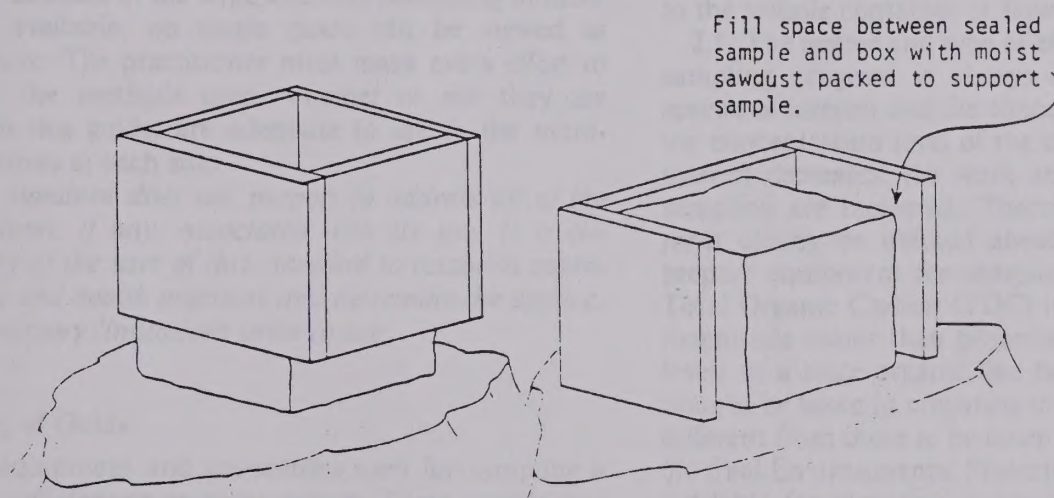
Perspective view of the box (open lid) in the exploded view.
